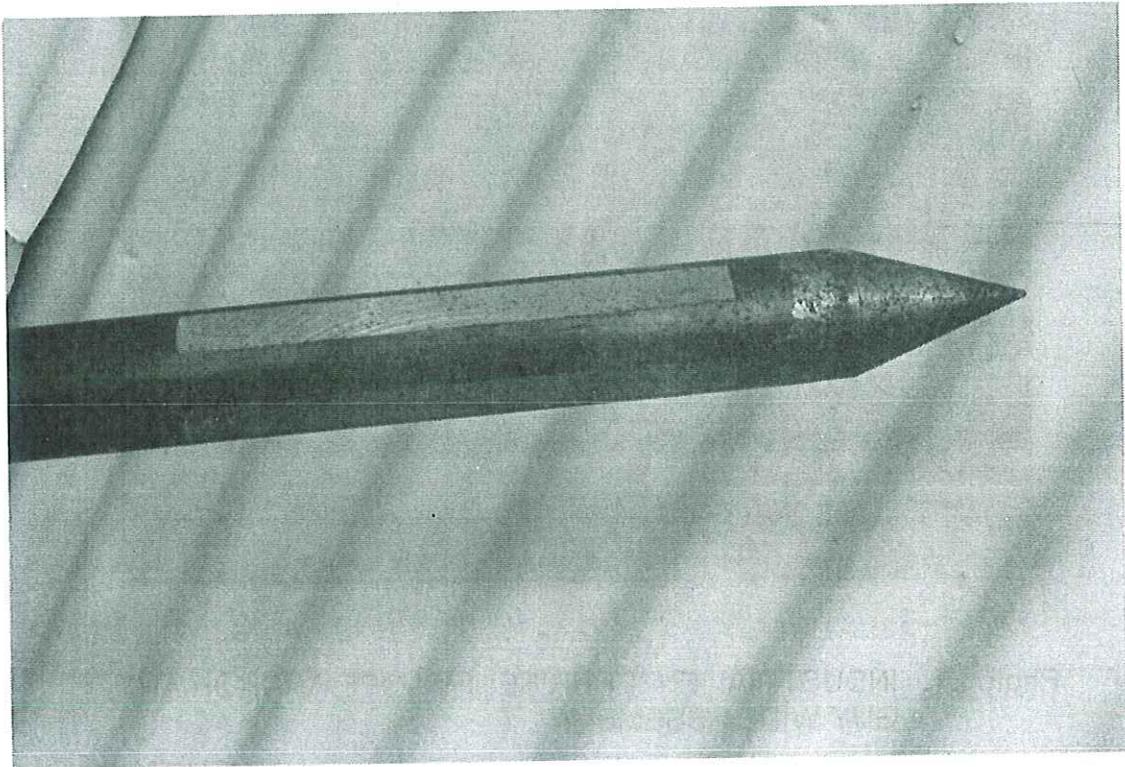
CLOSE-UP OF THE 2-INCH-DIAMETER MACHINE-GROOVED STEEL PIPE USED TO INSTALL THE INDUSTRIAL ENTERPRISE ANCHORS. (Photo Courtesy of Alain Lazard)
